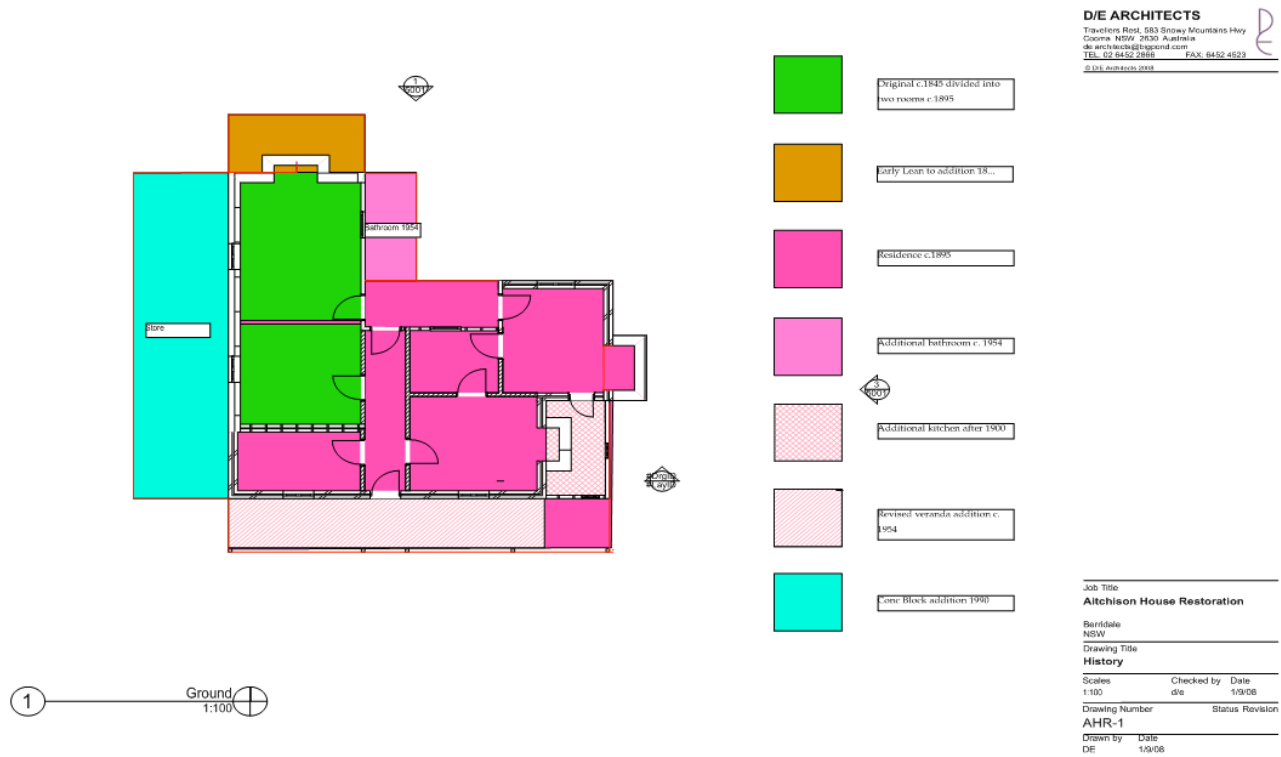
restoration plan, 2008, D/E Architects, Cooma
